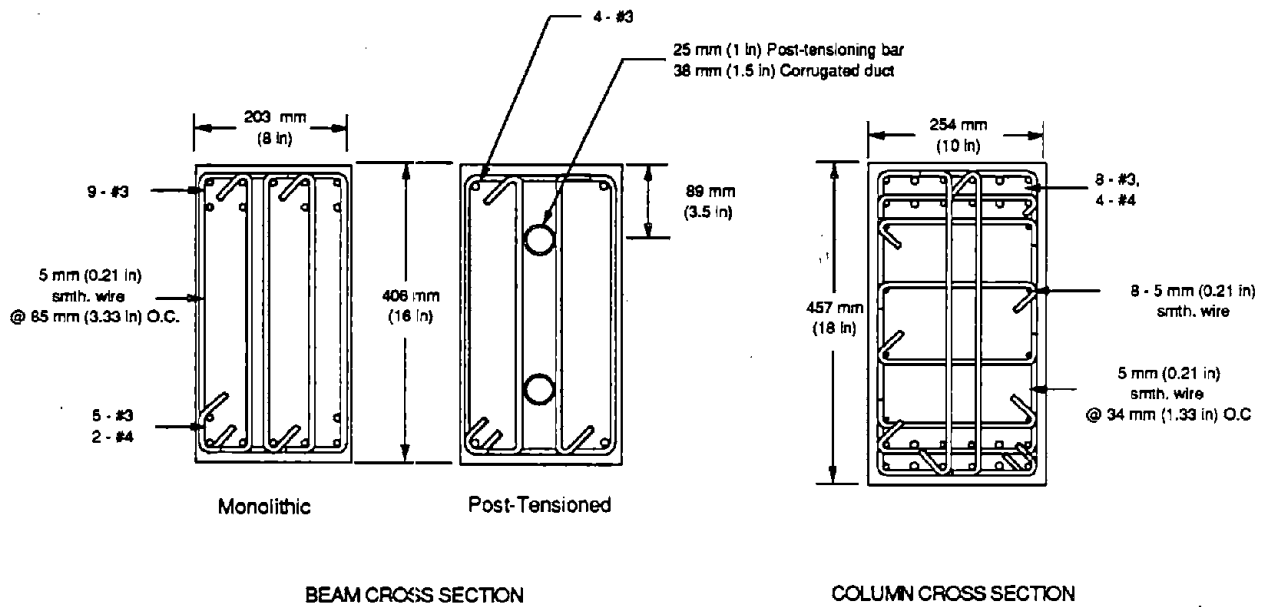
Reinforcement details for monolithic Zone 4 specimens and precast concrete specimens A & B.
